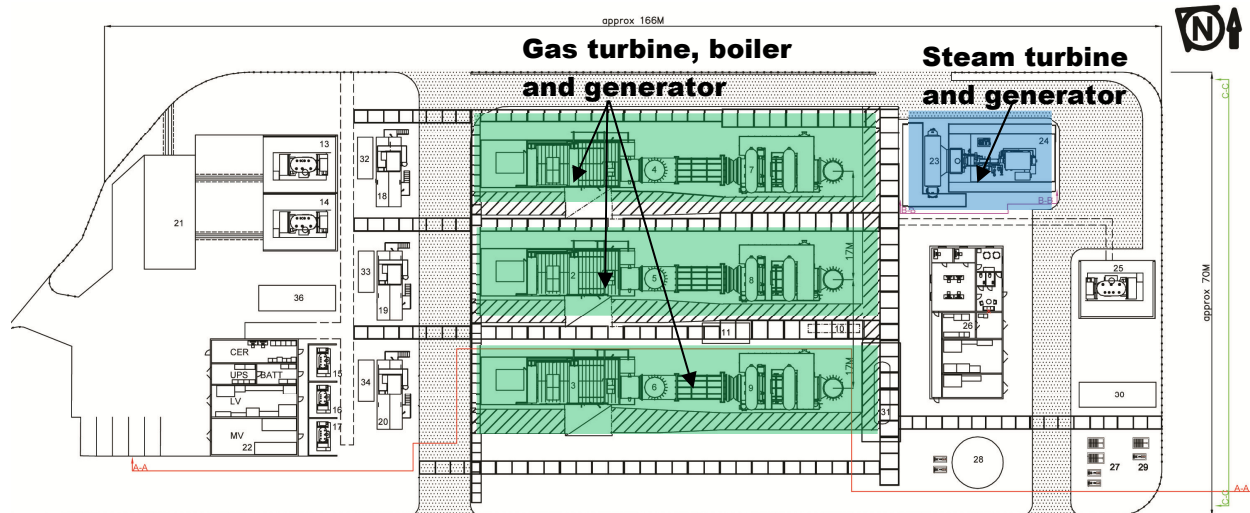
Proposed general arrangement (plan) of new combined cycle power plant
